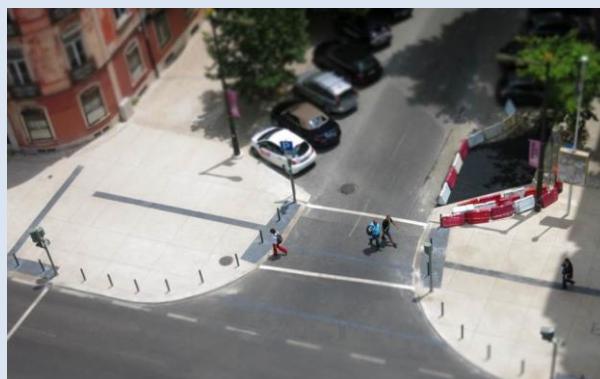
After pavement extension and raised treatment at a pedestrian crossing
